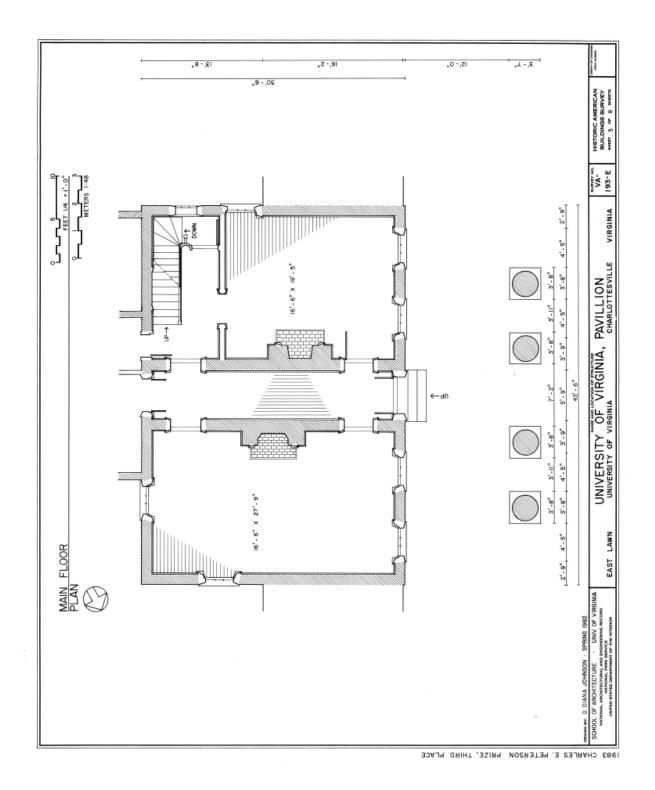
Historic American Buildings Survey (HABS) first floor plan of Pavilion X. Sheet 3. Note the locations of the door and window openings on the original east elevation (left side of drawing).
